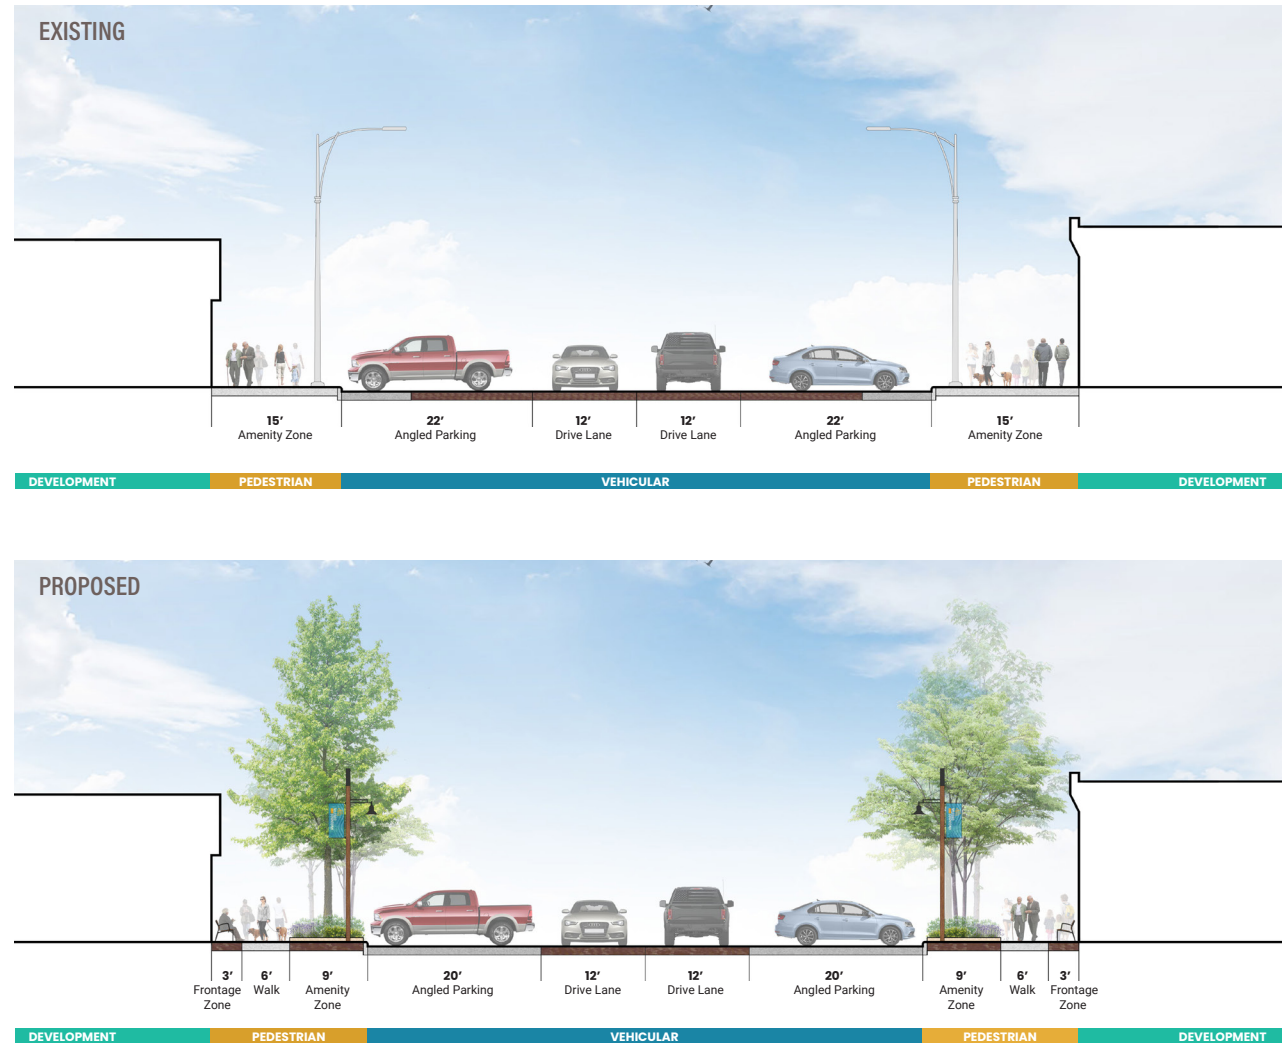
/ EXISTING AND PROPOSED SECTIONS OF 1ST STREET IN DOWNTOWN MILFORD
